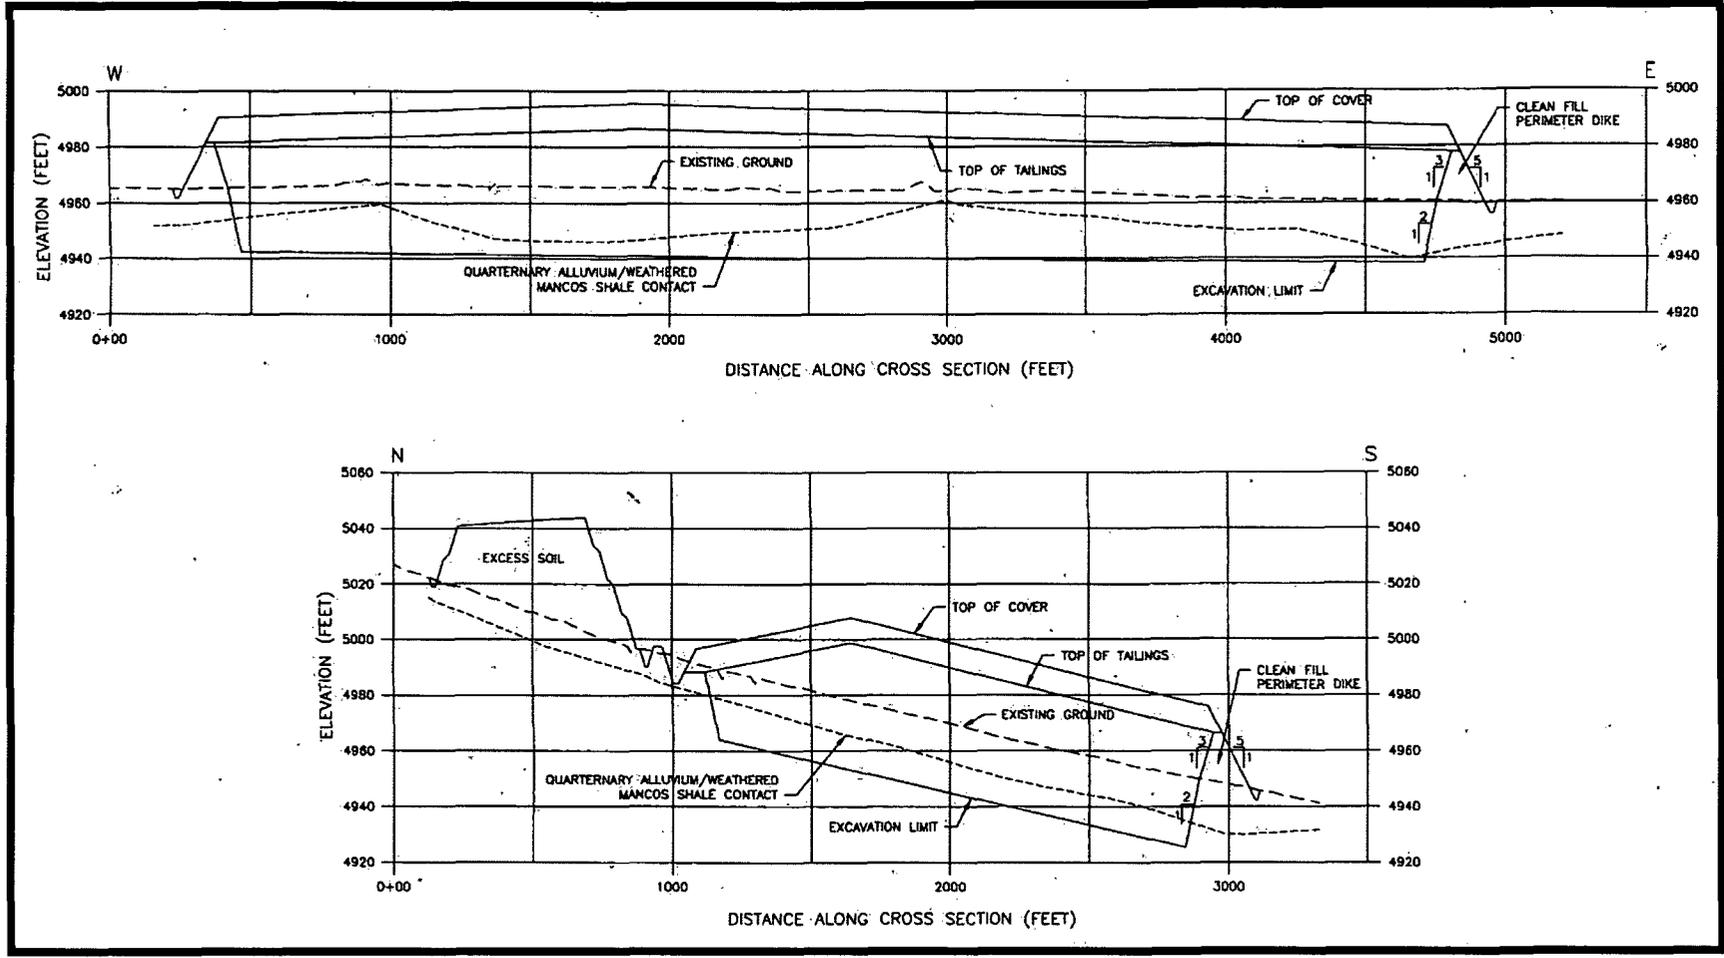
Typical Cross Sections for Crescent Junction Disposal Cell
